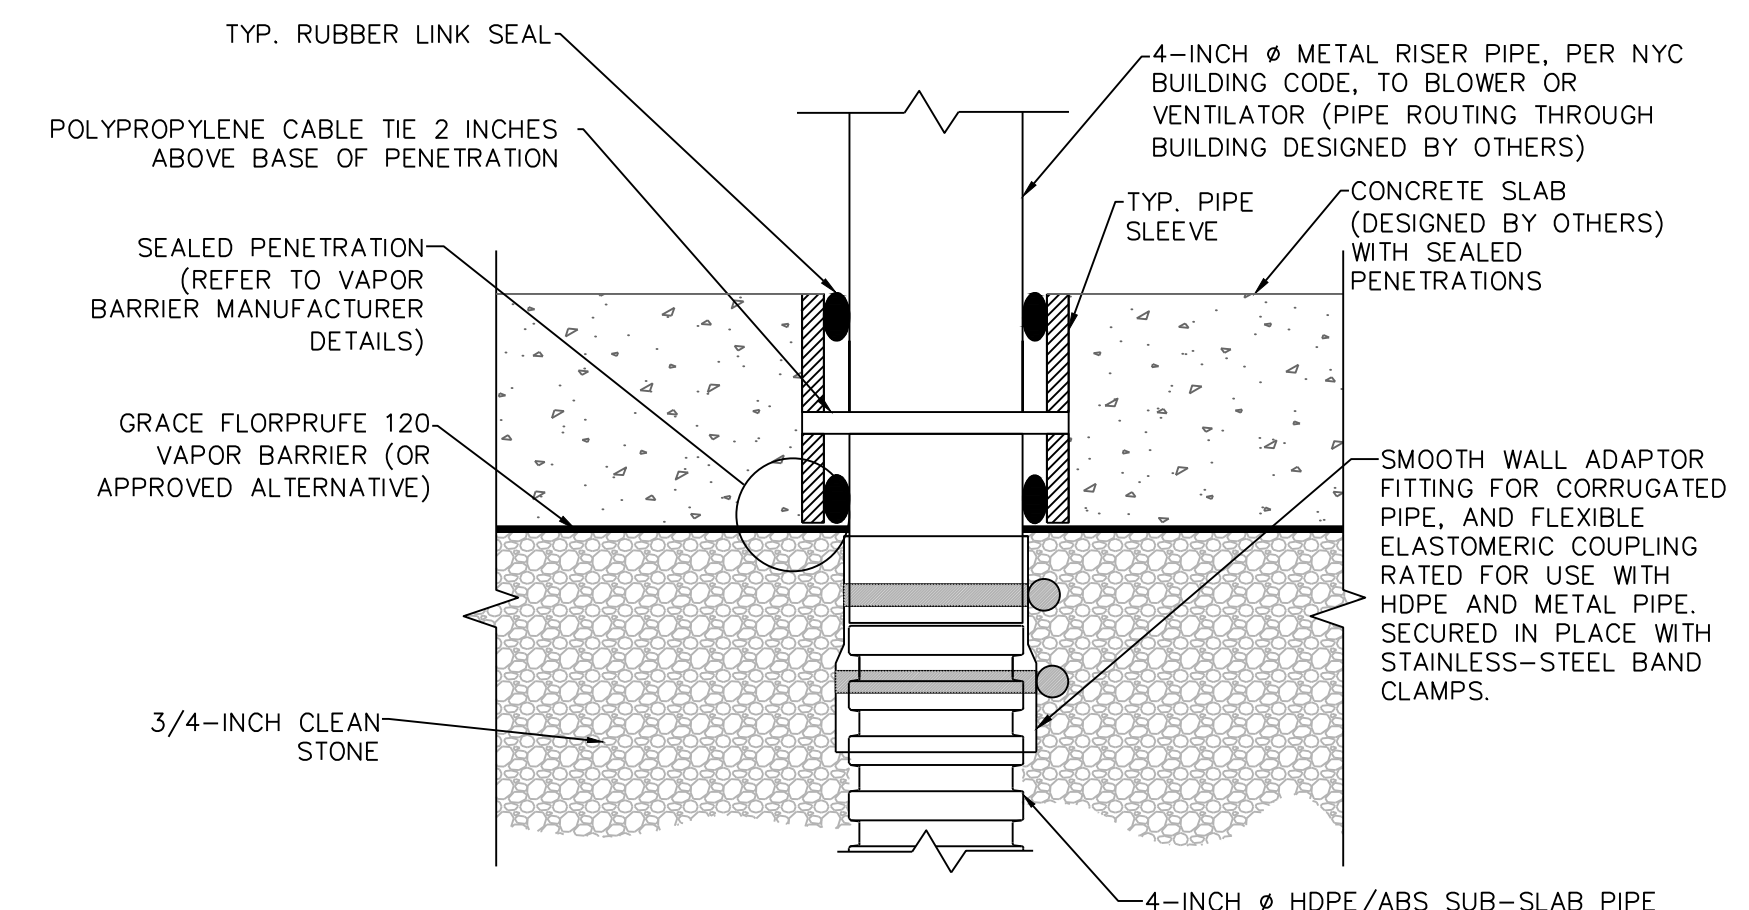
TYPICAL VAPOR BARRIER ASSEMBLY AT PENETRATION
